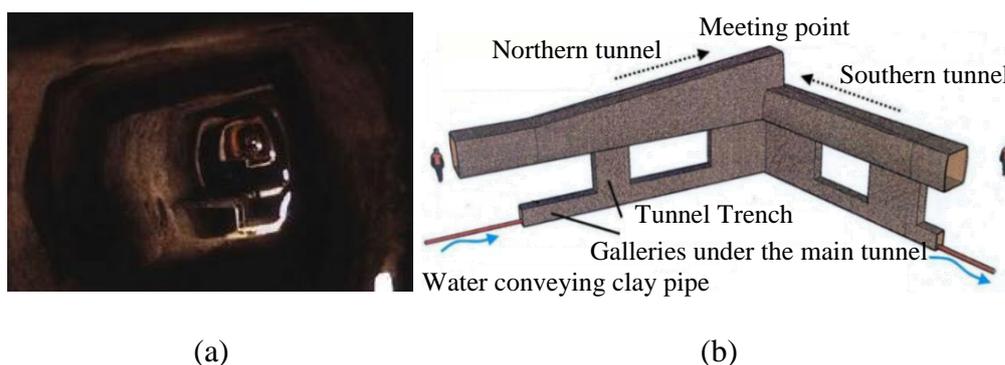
The Tunnel of Samos (a) Cross Section of the tunnel (Apostol, 2004); (b) A sketch of meeting points of the tunnel boring sections (Angistalis and Kouroumli, 2014)
